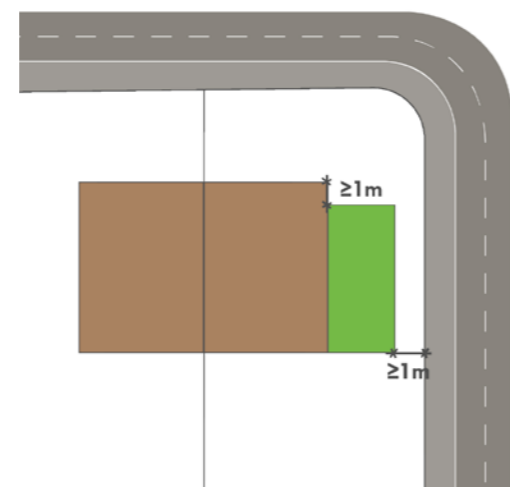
Side extensions for end of terrace or semi-detached houses will require further set backs
